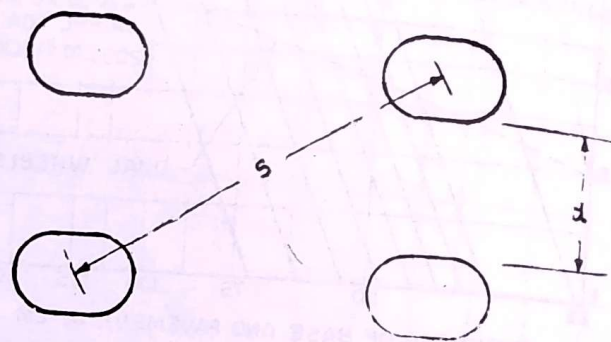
Dual-in-tandem Landing Gear Assembly
